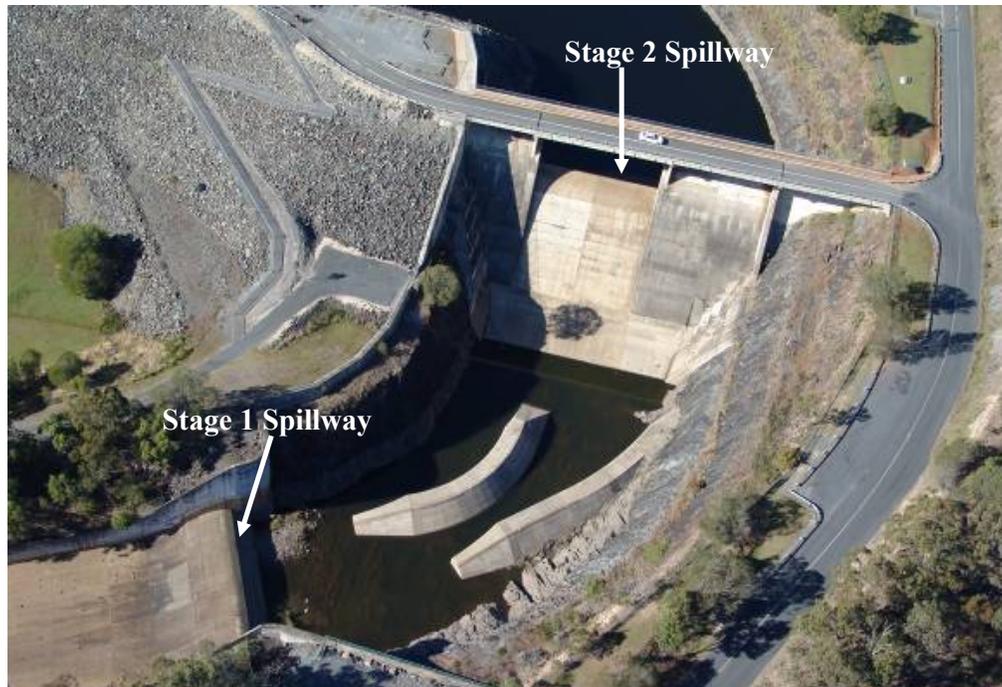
Aerial Photograph of Hinze Dam Spillway Prior to Construction
